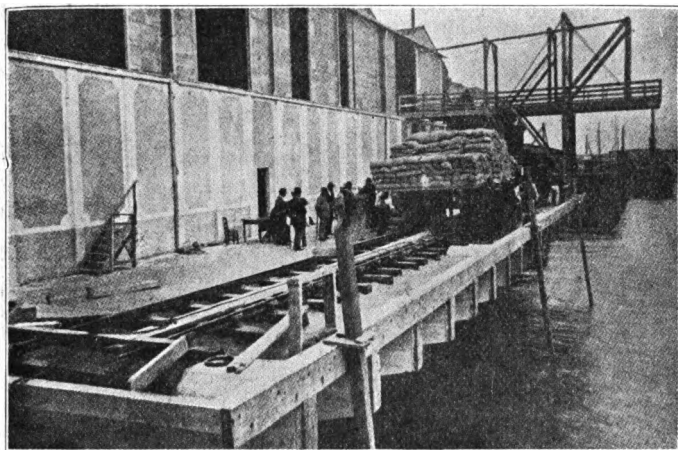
Cantilevers of 27 feet carrying a Railroad track.
